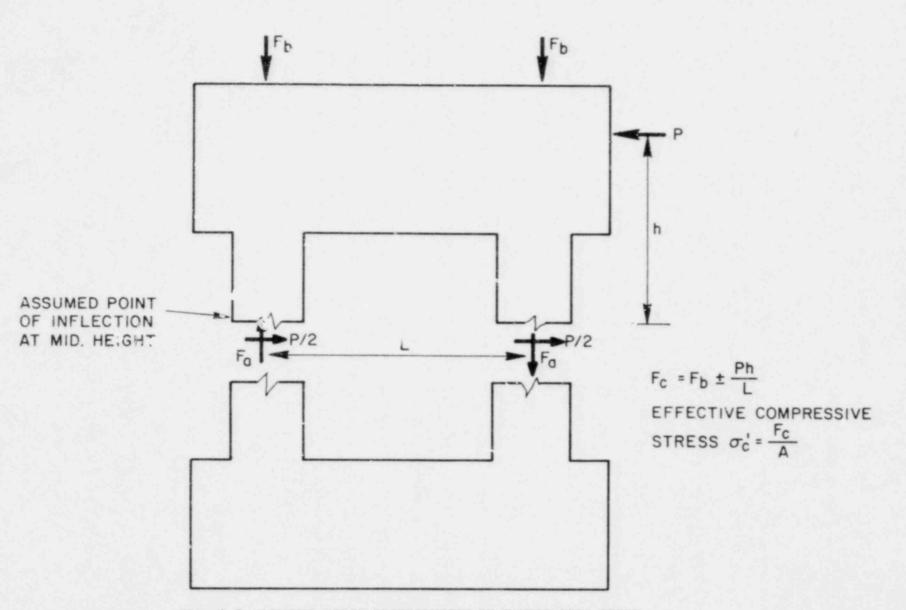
ASSUMED FORCE DISTRIBUTION IN DOUBLE PIER TESTS
